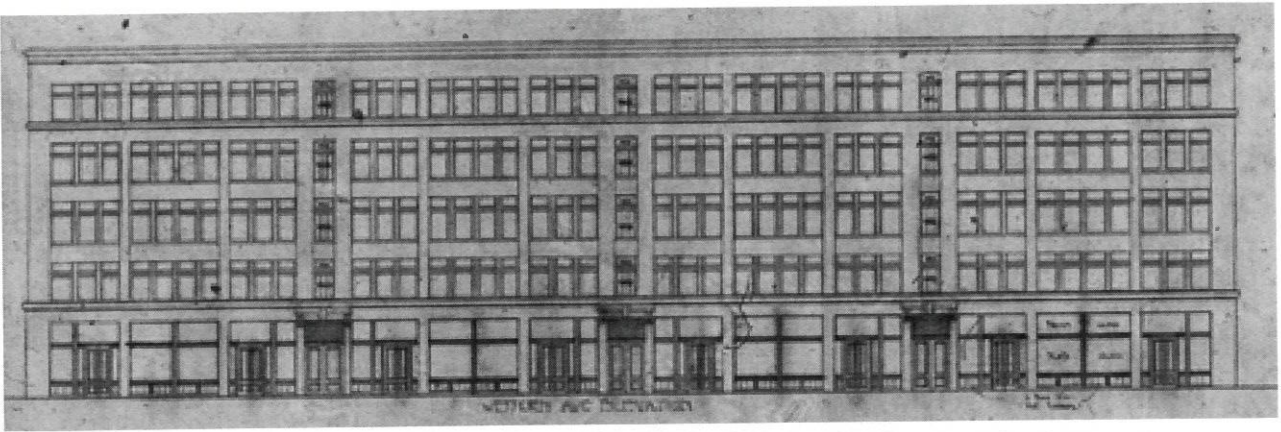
Pacific Warehouse Building - Western Avenue Elevation, c. 1909
